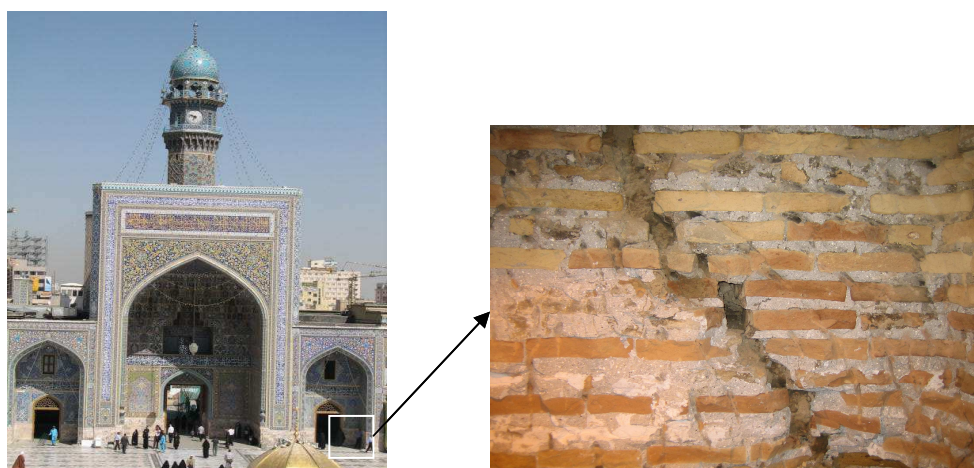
(a) Saat Edifice and the position of the crack, (b) Crack in the foundation
